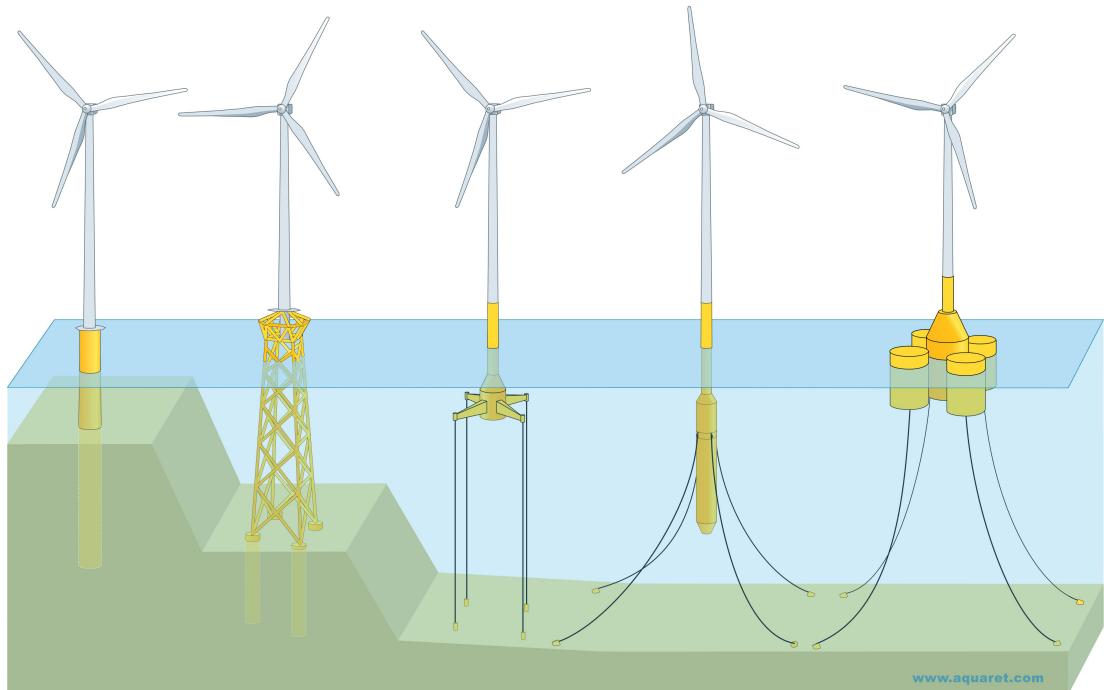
Sketch showing fixed bottom and floating foundation types
